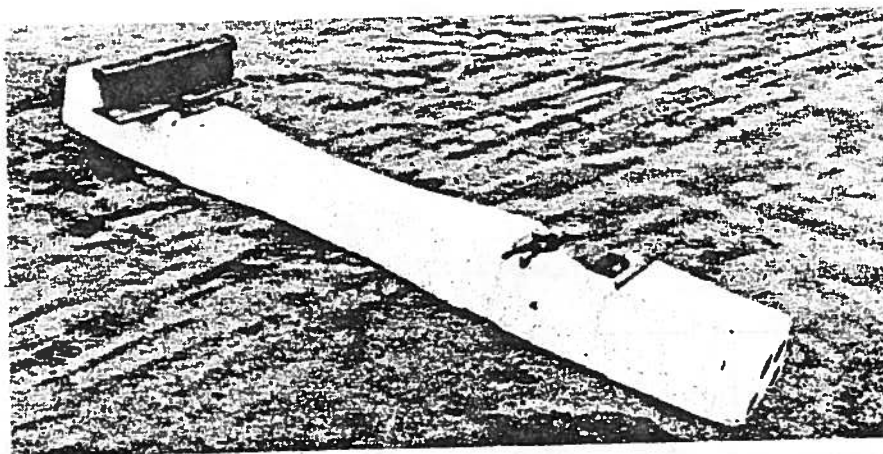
PRESTRESSED CONCRETE MONOBLOCK CROSSTIE, TYPE STUP (FREYSSINET INTERNATIONAL)
